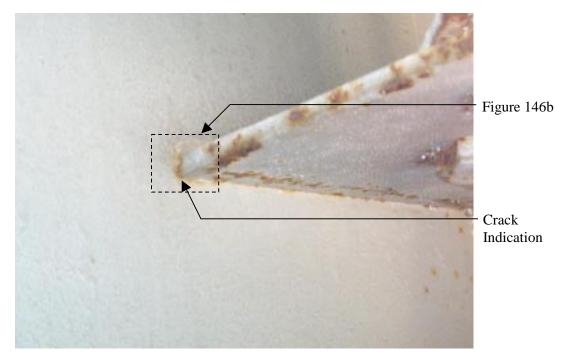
One-half of the lateral gusset plate-to-girder web and vertical stiffener inspection area.
